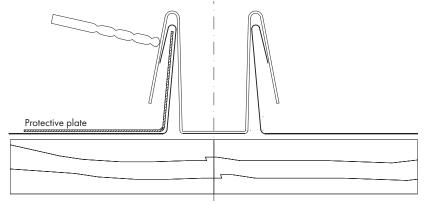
Drilling hole for rivet using a protective plate to prevent damage to panel
